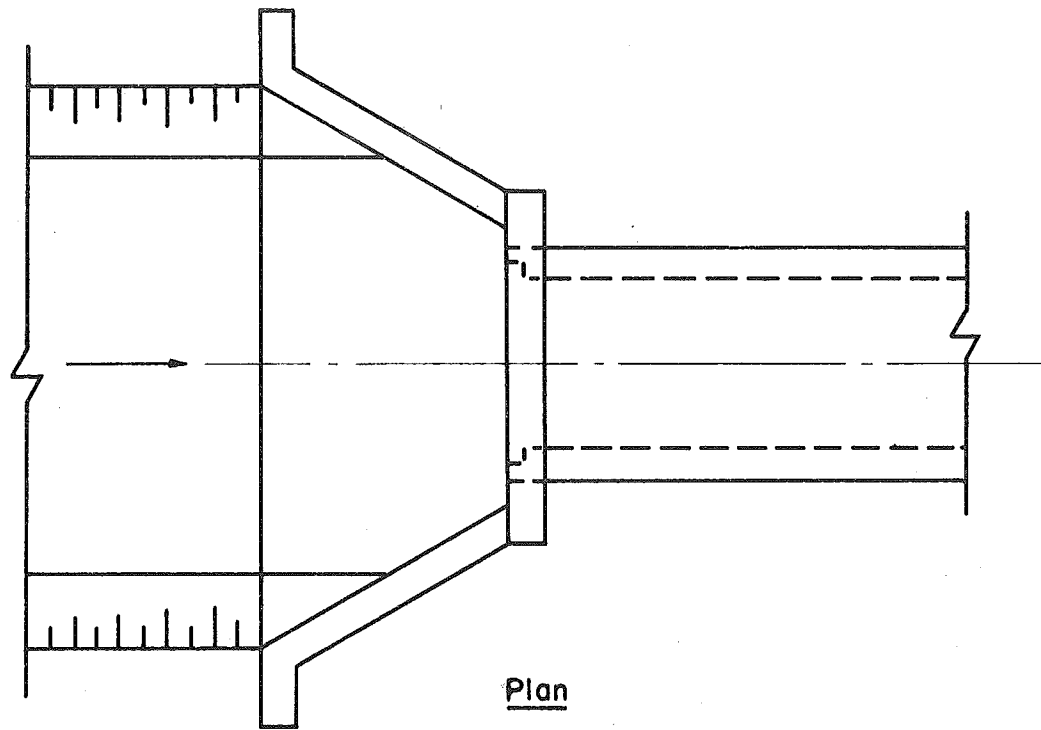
Type A - entrance with headwall, wingwalls, and toe wall.
